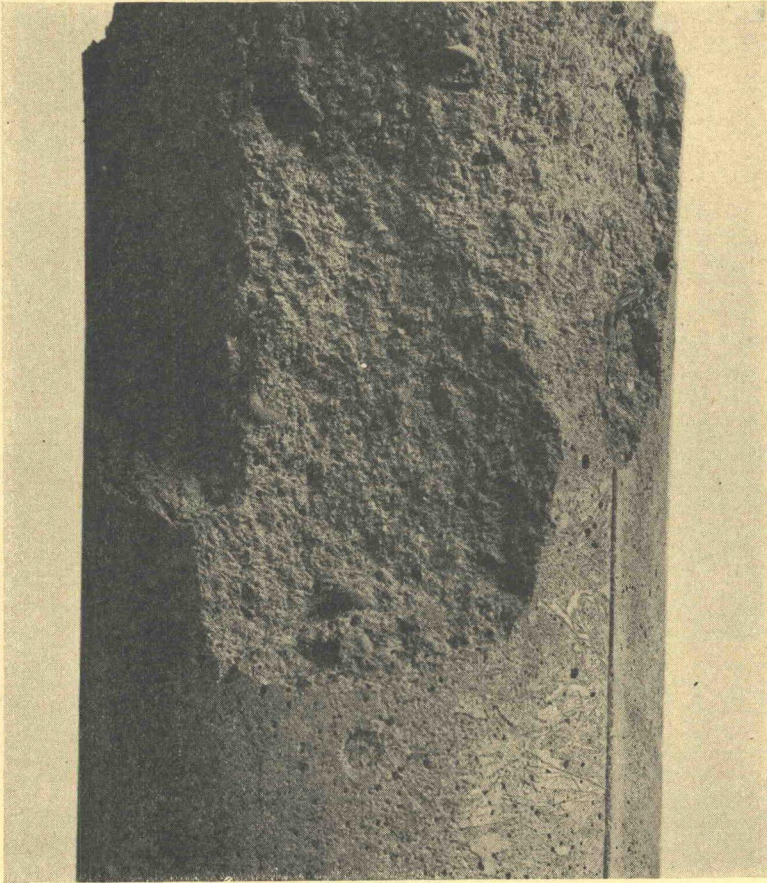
A Concrete Test Specimen Frozen before the Concrete Was Fully Set
